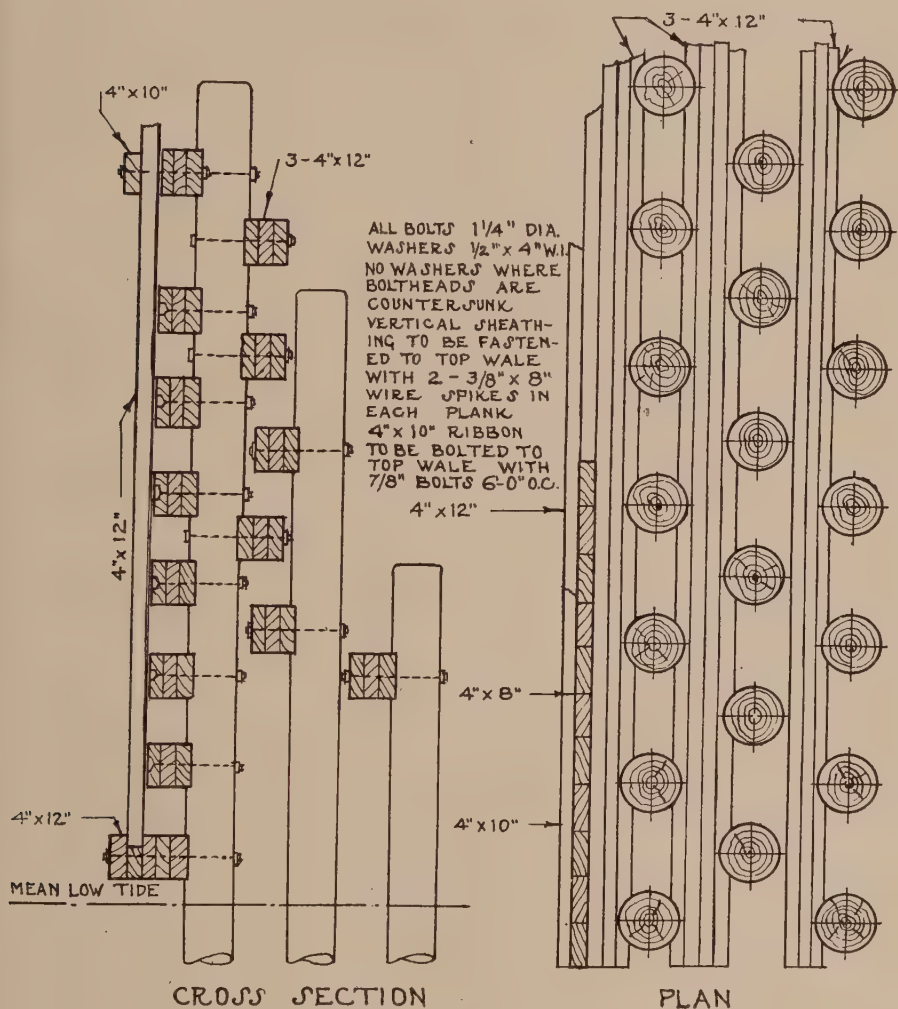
Plan and cross-section of a three-bank ferry rack.
